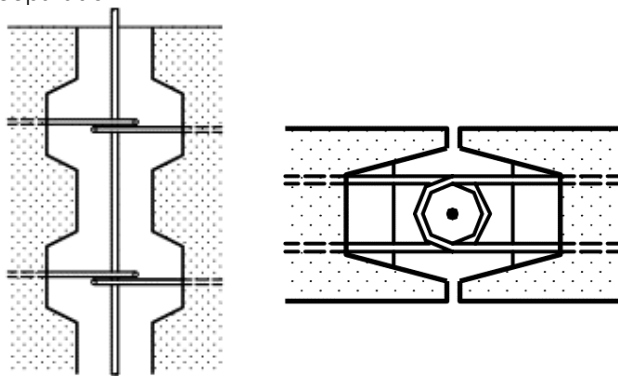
Typical shear key connection at a vertical joint between wall panels (fib, 2008)
